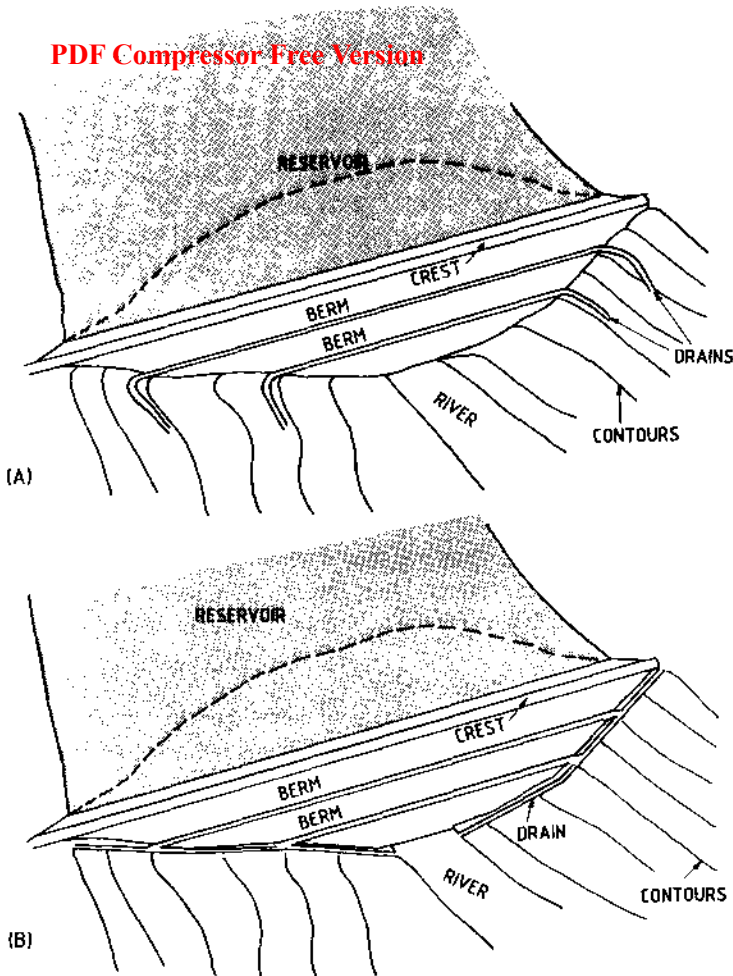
Berms and drainage for the downstream slope of earthfill dams where grassing is used to control erosion.
